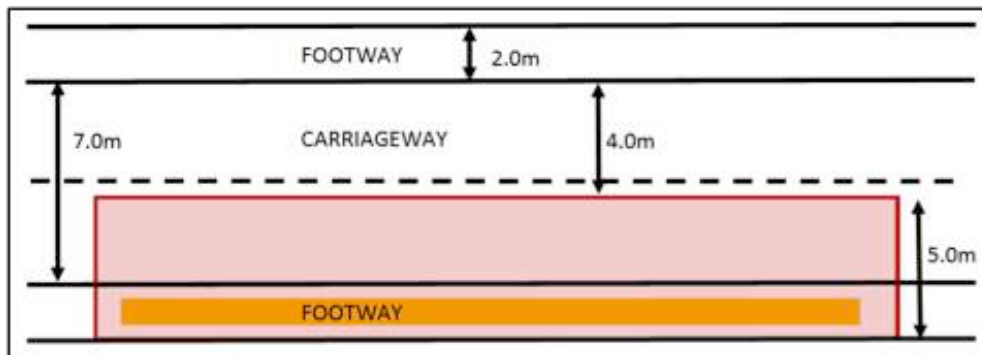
CONSTRUCTION ZONE ON FOOTWAY
